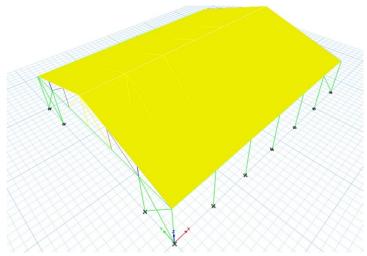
3-Dimensional model of Conventional Steel Building having 30m span Pratt truss
